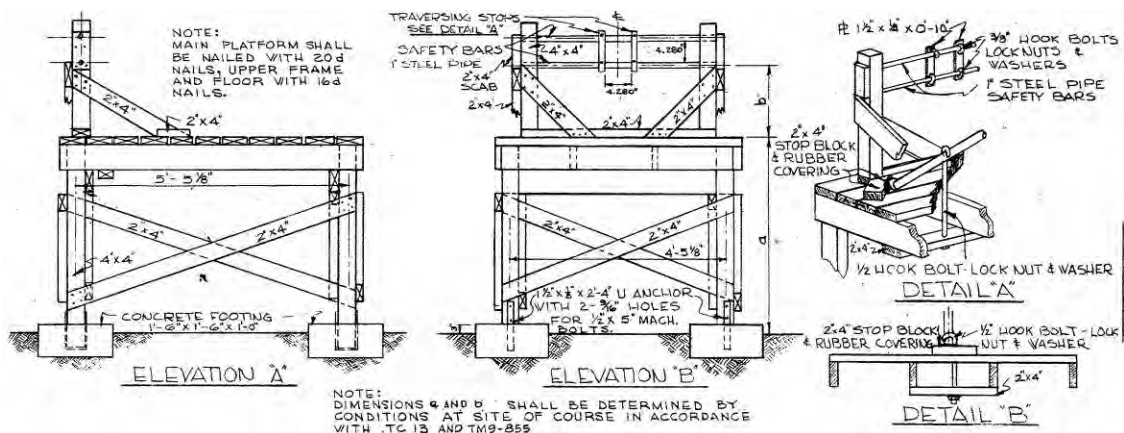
Infiltration course, machine gun platform, elevations A & B, Fort Bragg, NC, 1951 (standard drawing 28-13-34 sheet 1 of 1; infiltration course, typical layout and details; 21 November 1951).
